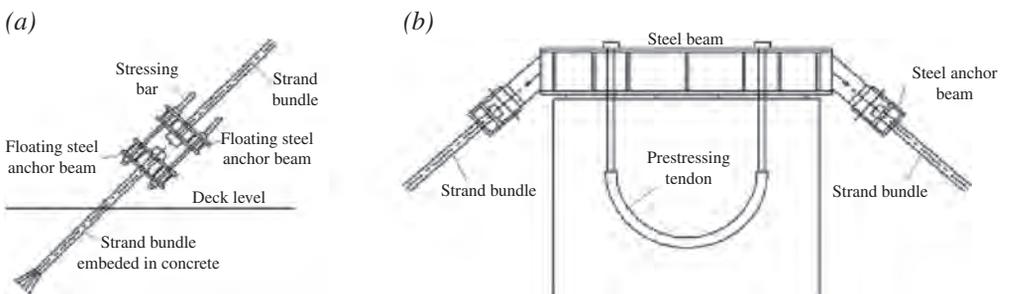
Anchorage of the temporary stay cables at the deck and pylon head levels
